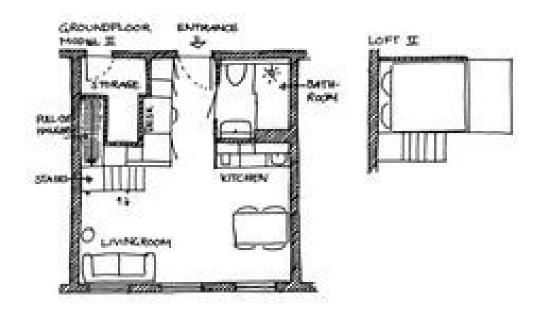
Floor plans before and after transformation (NRP Gulden Feniks; Pinterest)
